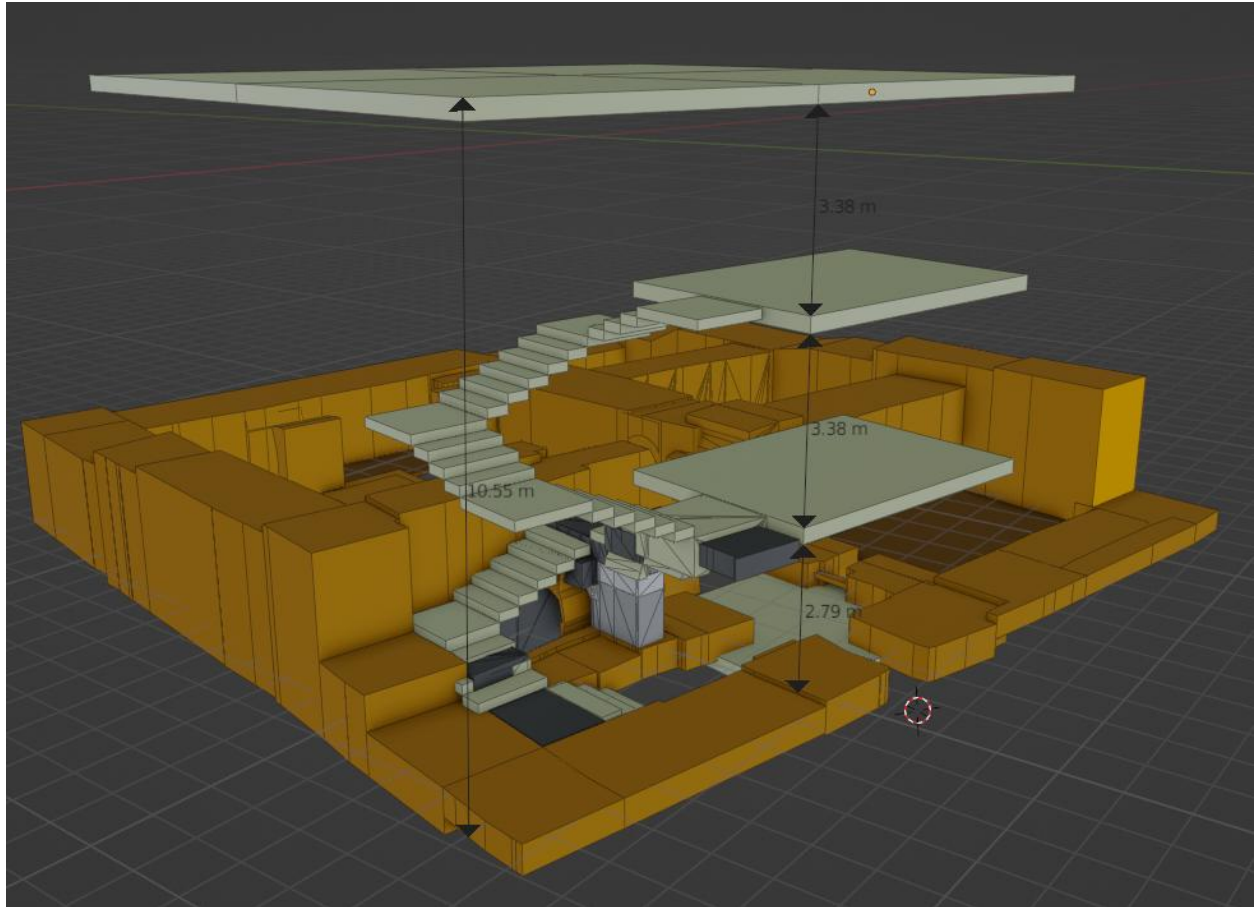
Reconstruction of staircase of the tower in the earlier phase.
